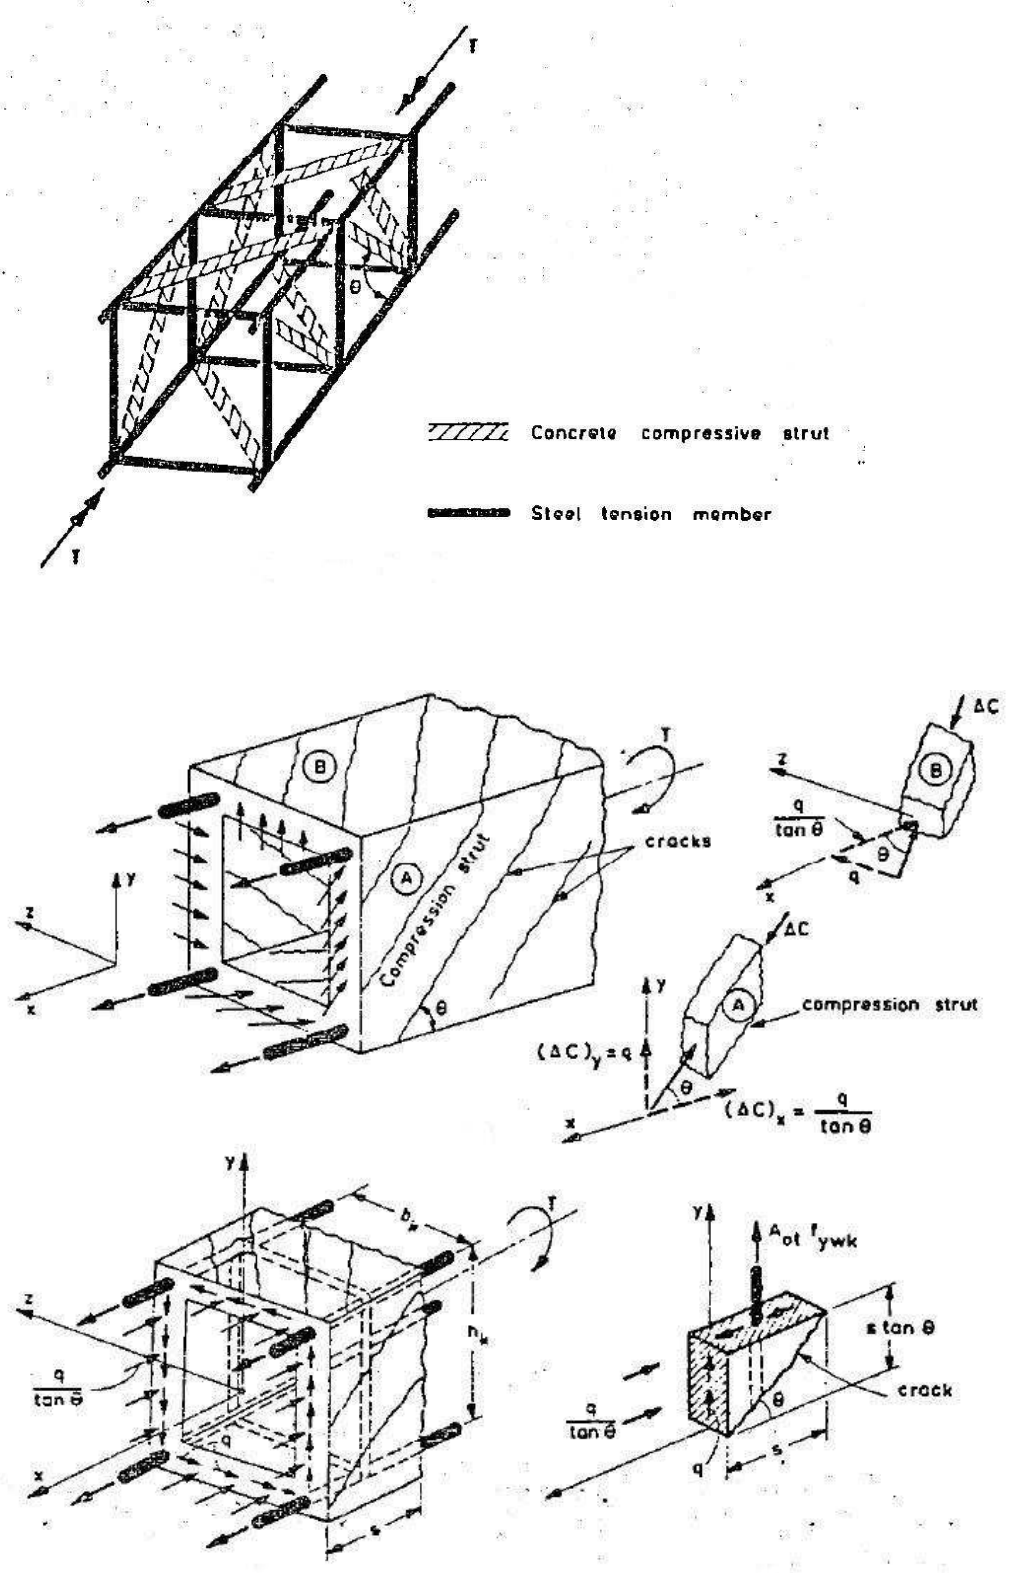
Space Truss Model (Ersoy et al.,2003).
